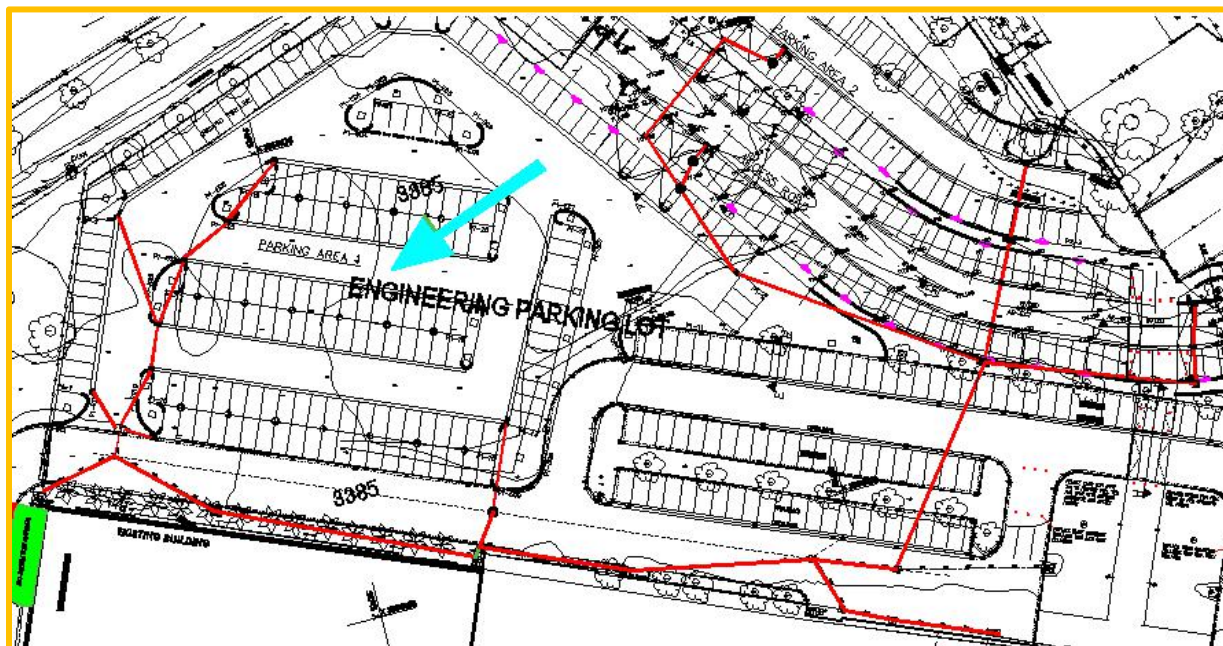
6: Drainage layout of the Stellenbosch engineering parking lot (Keens, 2011)
